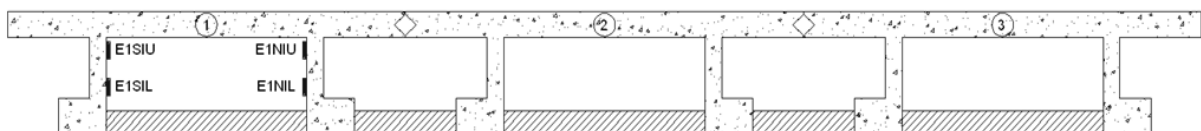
Layout of Vertical Web Transducers at 3/8 Span
